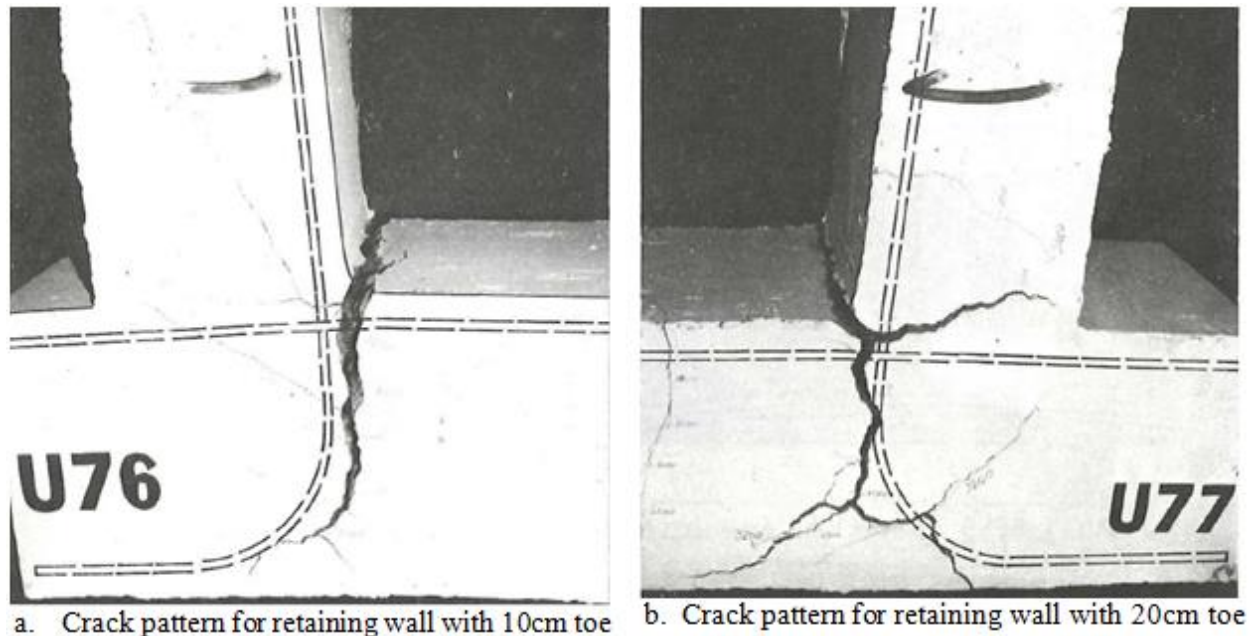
Bond failure in joint due to insufficient anchorage length in upper face (Nilsson, 1973)
